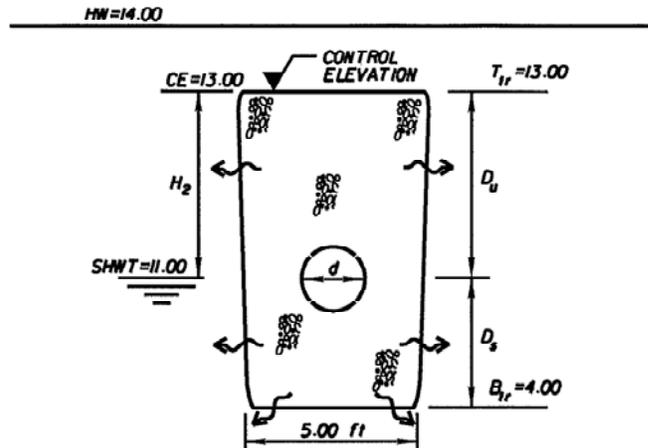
SAMPLE EXFILTRATION TRENCH
